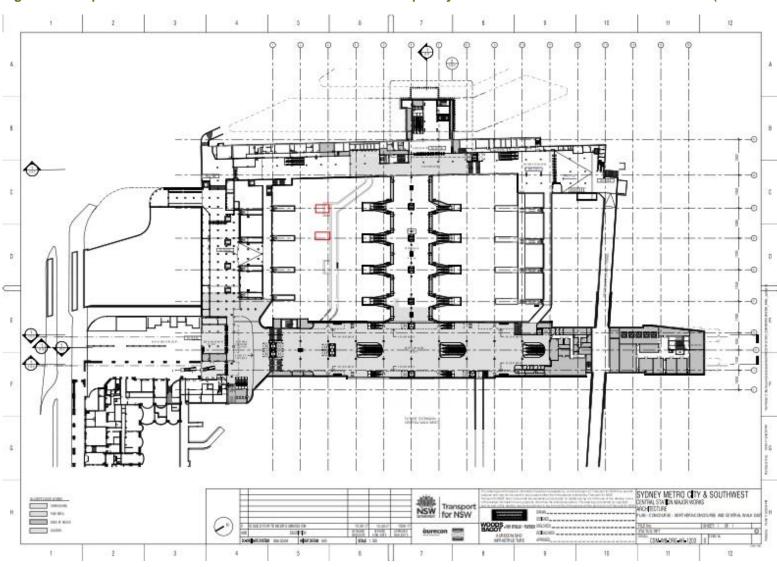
Proposed location of the excavation for the future temporary staircases on Platforms 20/21 and 22/23 (Source: Laing O'Rourke, 2018).
